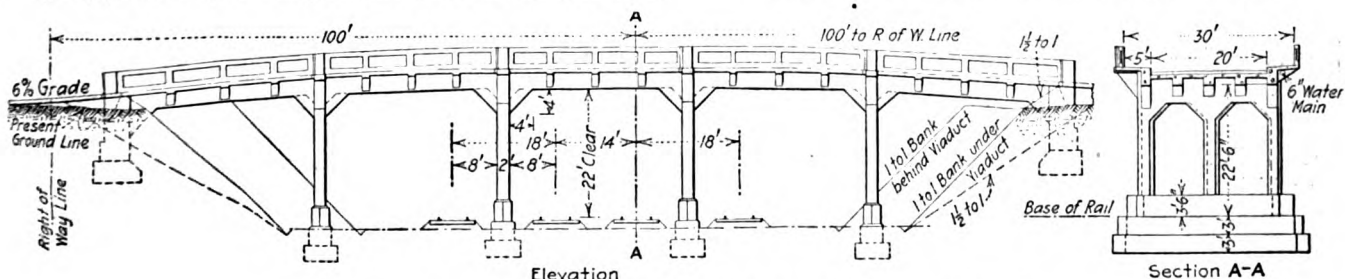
TYPICAL DESIGN OF REINFORCED-CONCRETE BRIDGES
